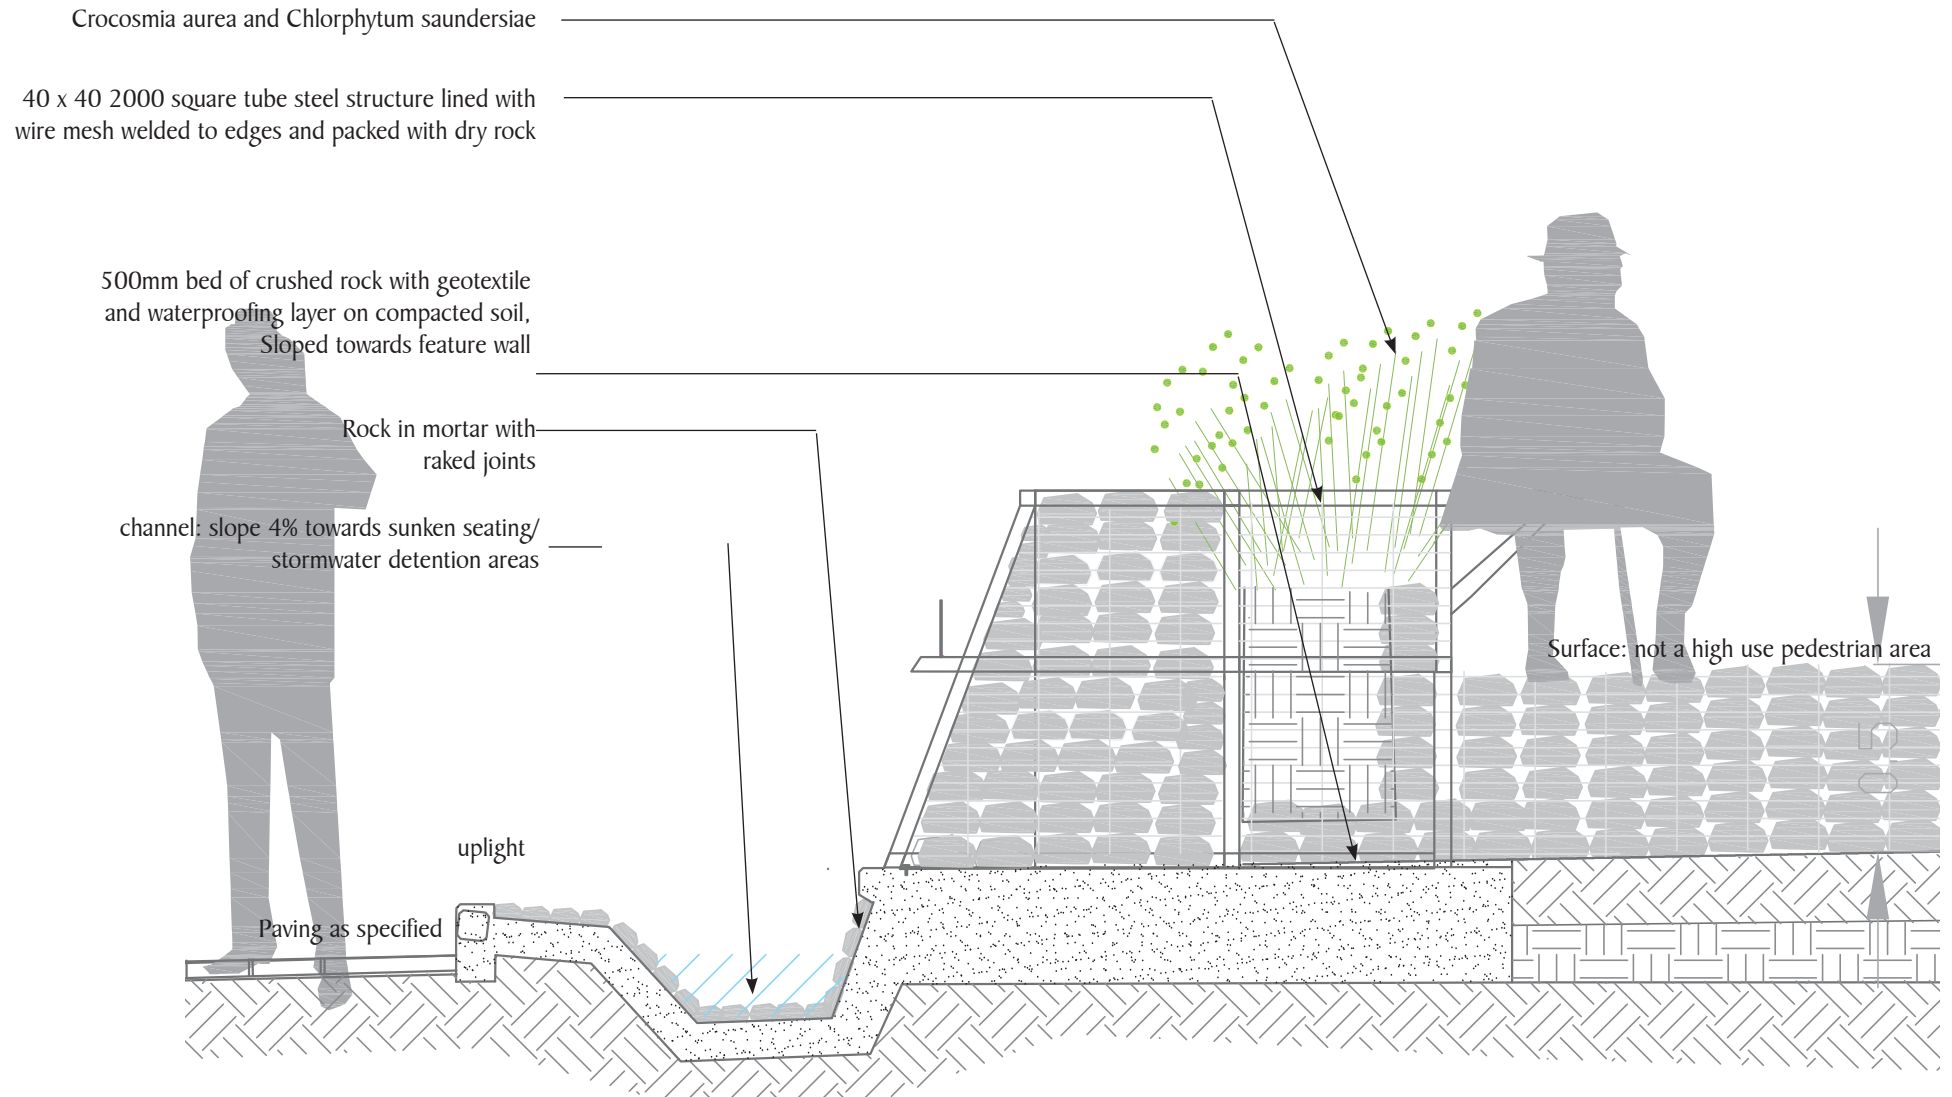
Section through stone packed wire-mesh and steel structure: feature wall (Author, 2008) Scale 1: 20
